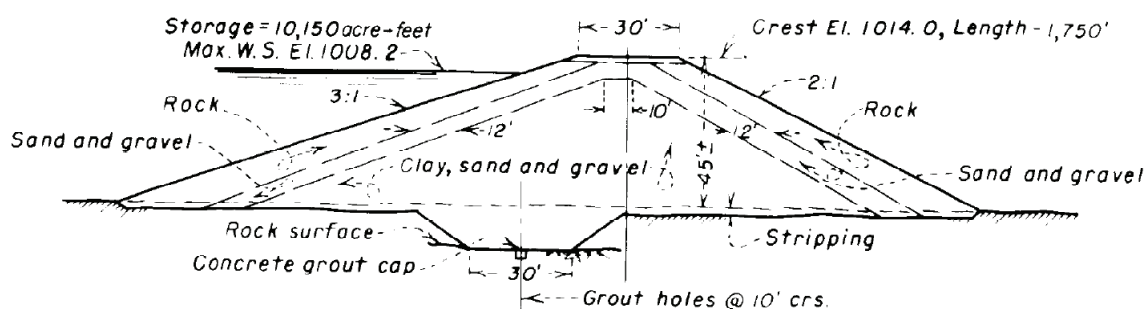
Typical illustrative example of a cross section of an earth fill (embankment) dam wall in imperial units with impermeable core and rock riprap protection against wind waves on its upstream slope (USBR, 1987)
